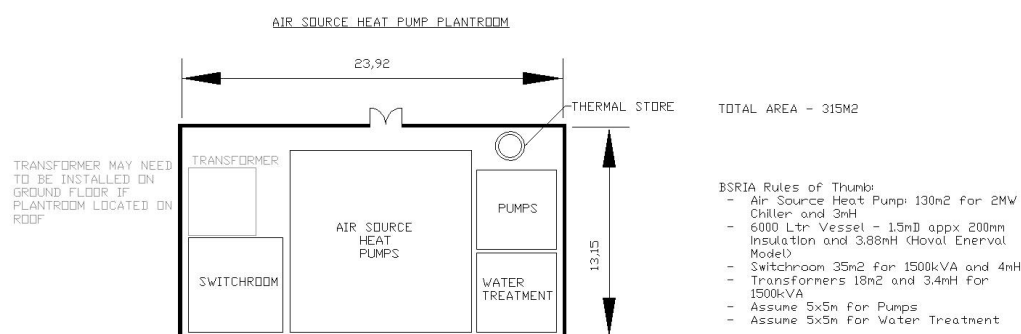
Typical Communal Air Source Heat Pump plant room space requirements
